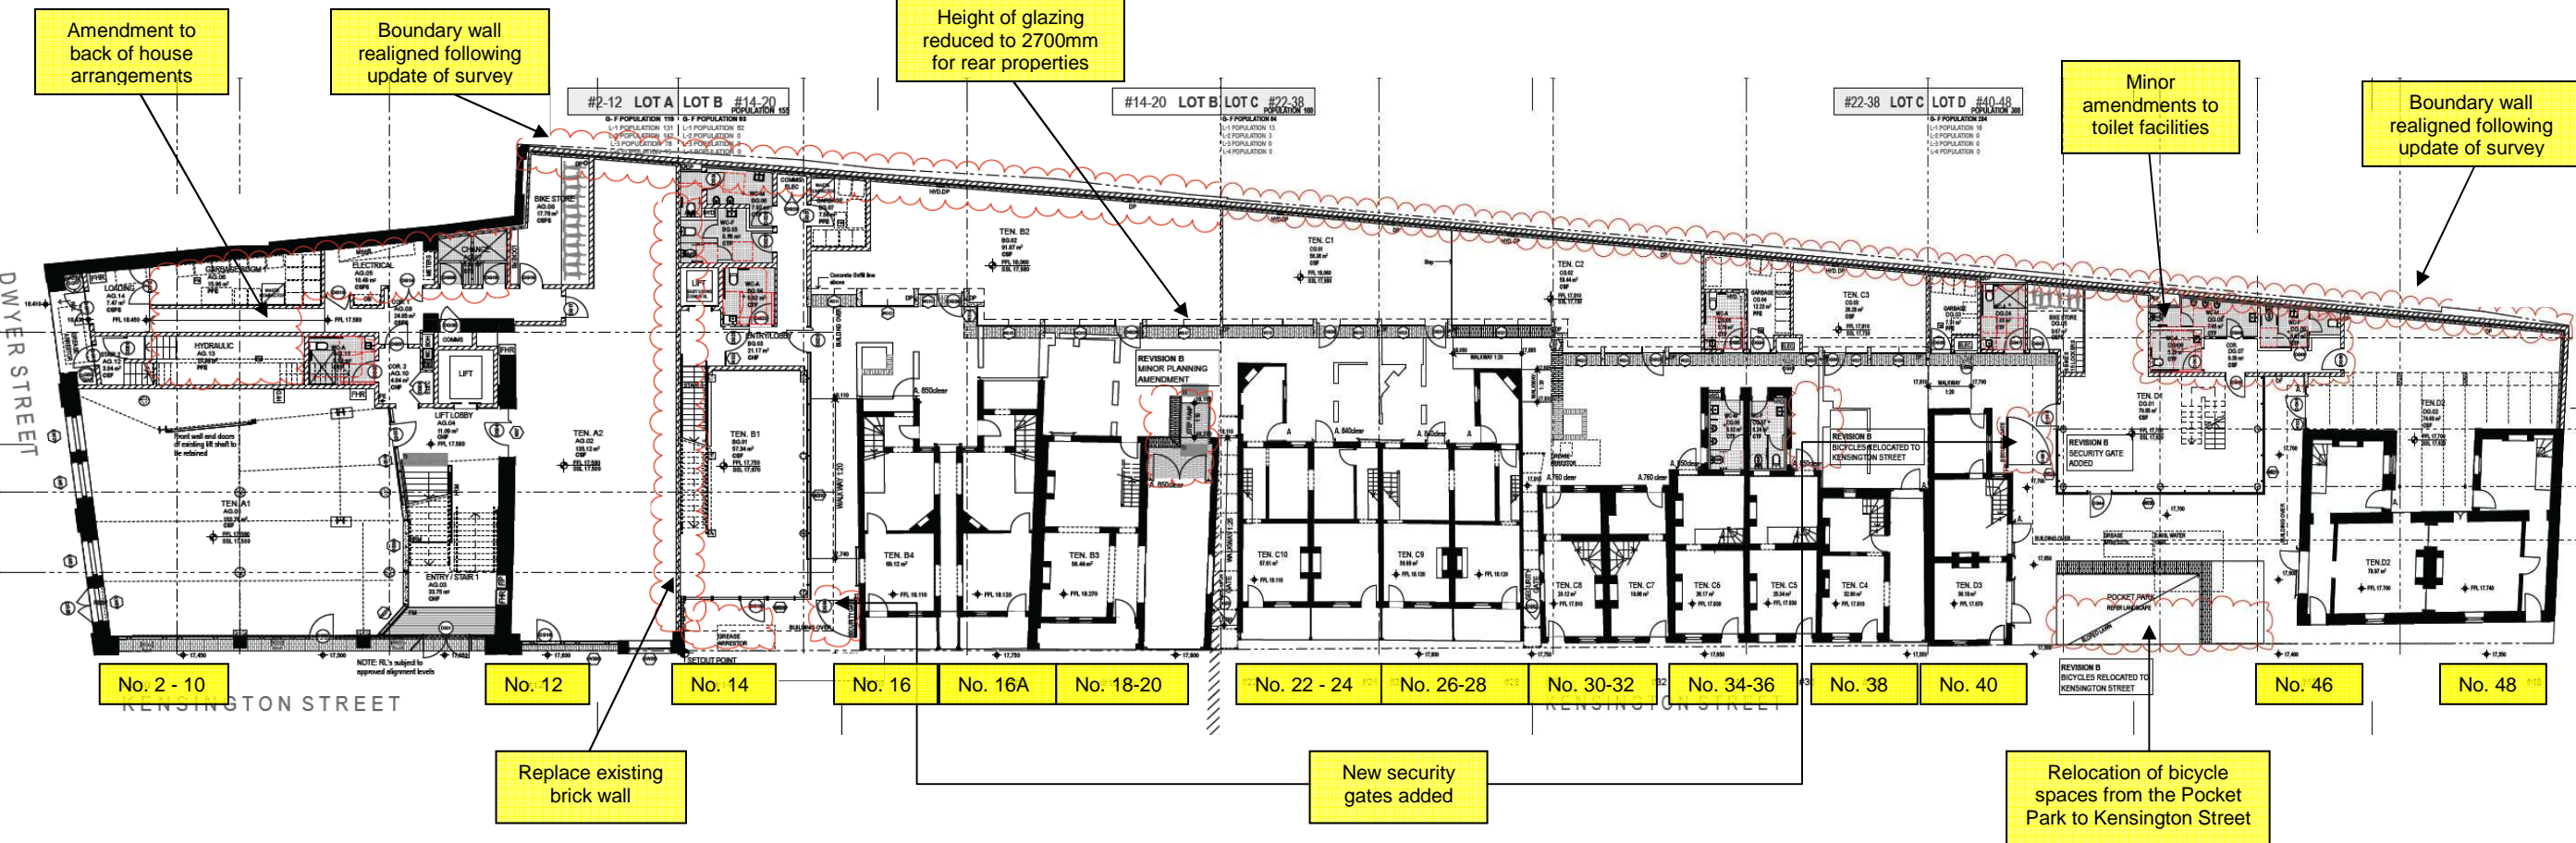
Proposed amendments to ground floor of development (Source: Architectural plans from Proponent's Application)
